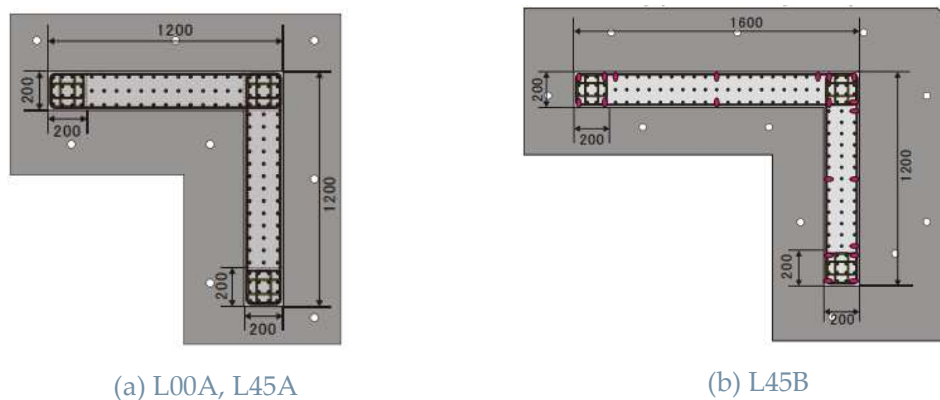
Cross Section of test specimen scale 1:4.5. Dimensions in mm. (Inada et al., 2008)
